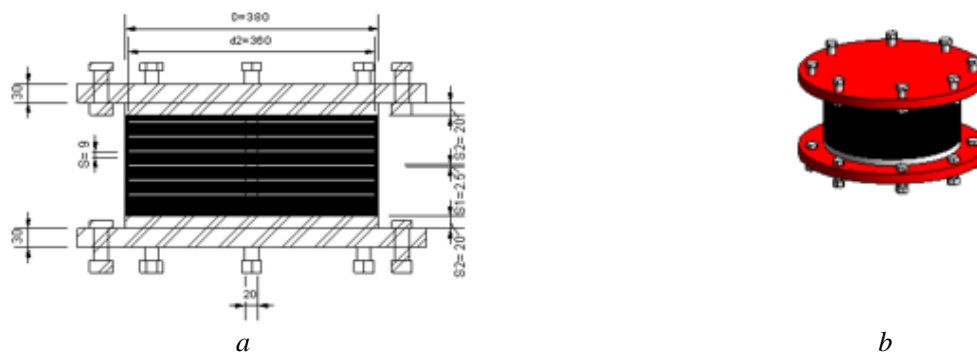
RMLSIS used in RA, mm. a - geometric appearance, b - three-dimensional appearance
